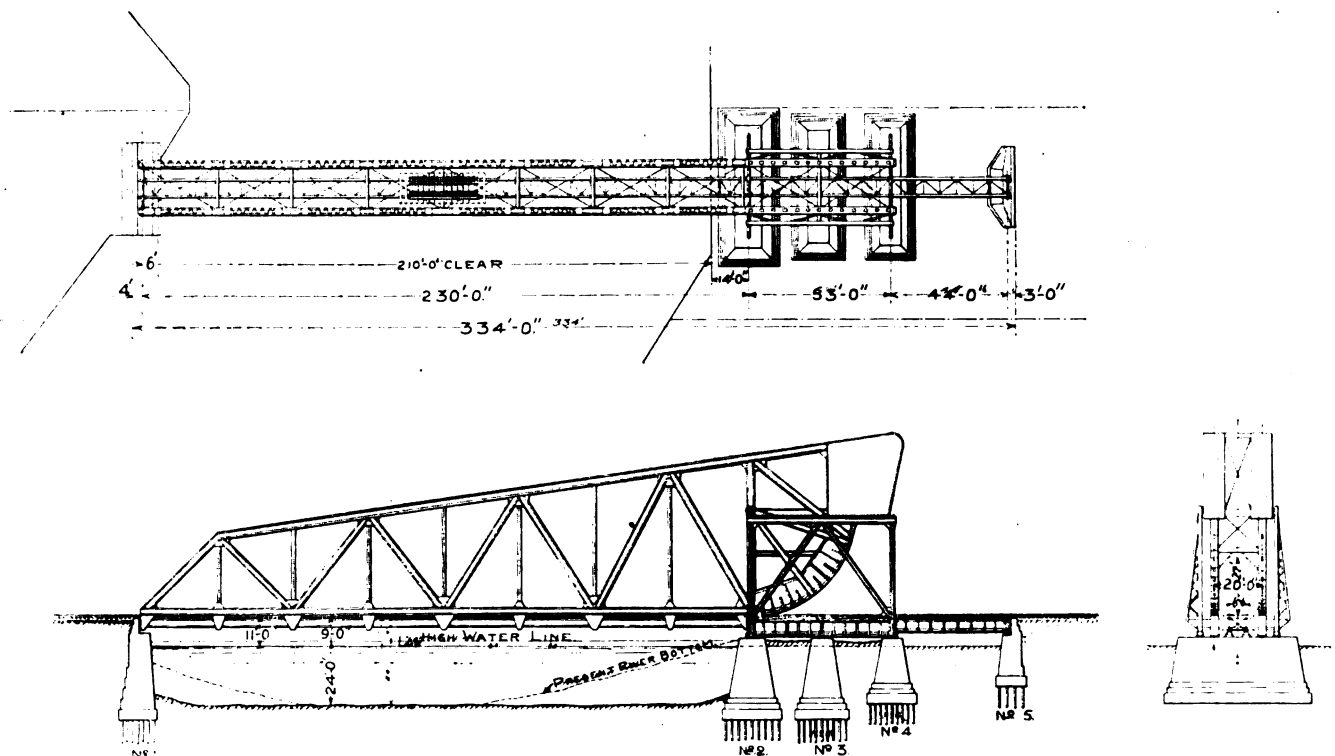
GENERAL PLAN OF SCHERZER BRIDGE FOR THE B. & O. RAILROAD AT CLEVELAND.
